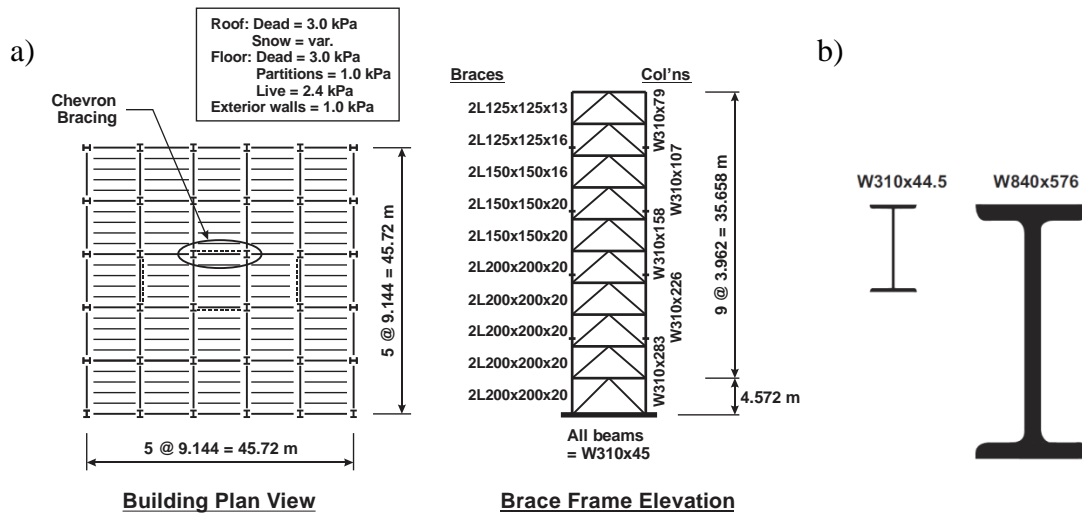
a) Plan view and braced frame elevations of the 10-story building, b) Required cross section of the beam at the 1st level of the chevron braced frame using ASCE 41-13.
